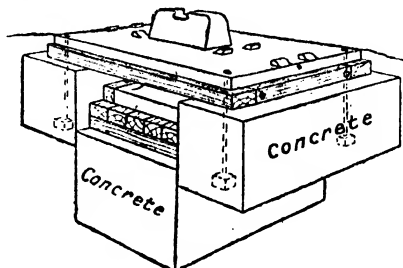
Typical Foundation for Steam-Hammers of the Arch Form.
